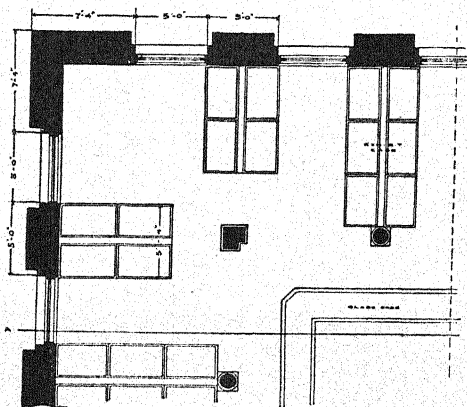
Chicago Academy of Sciences. Plan of second or gallery floor (in part).
